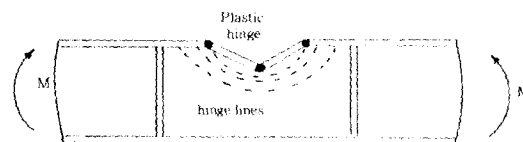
Failure Mechanism of plate girder by bending moment
